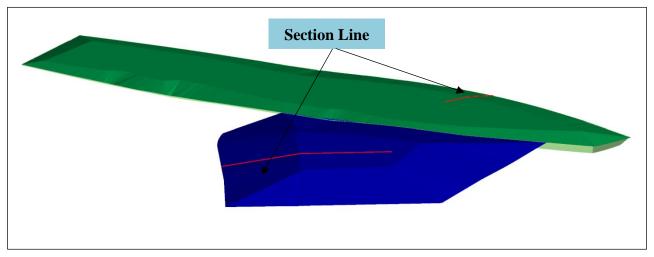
Vulcan North Pit Final Landform Design – North Facing View Showing In-Pit Dump (Green) and Ex-Pit Dump (Blue) Footprints
